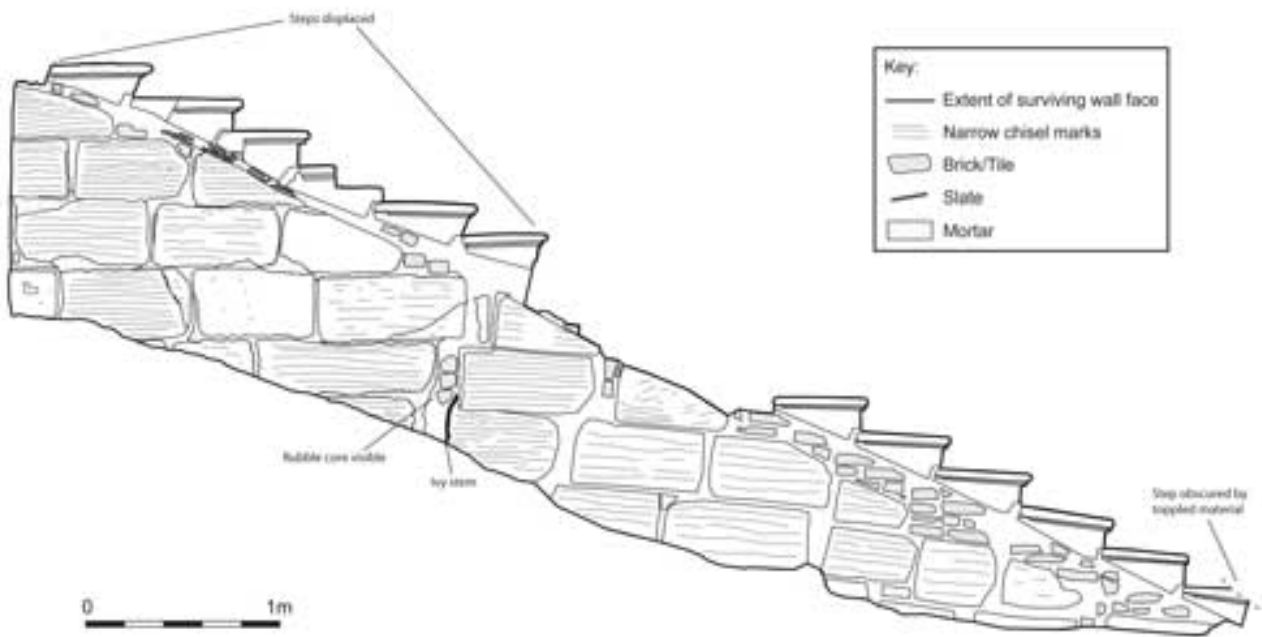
Structure 1, West Stair: Elevation d (South-facing revetment)
